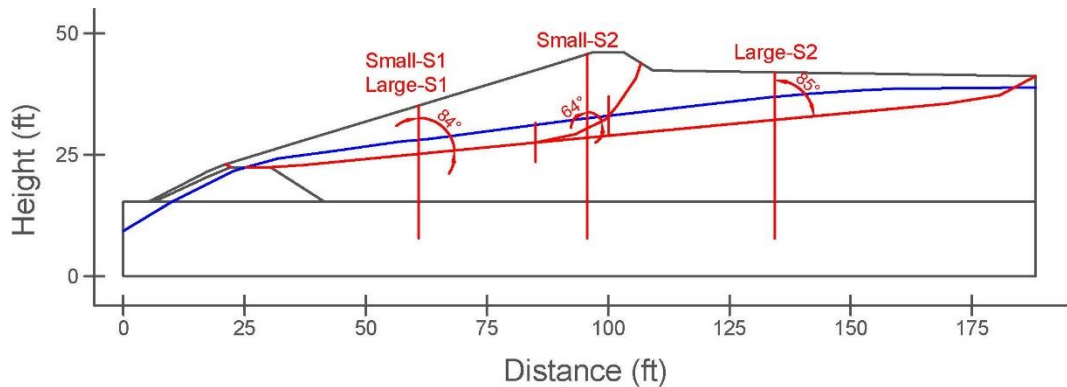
Sub-sectioning of the cross-section and failure plane for Hokkaido Tailings Dam
